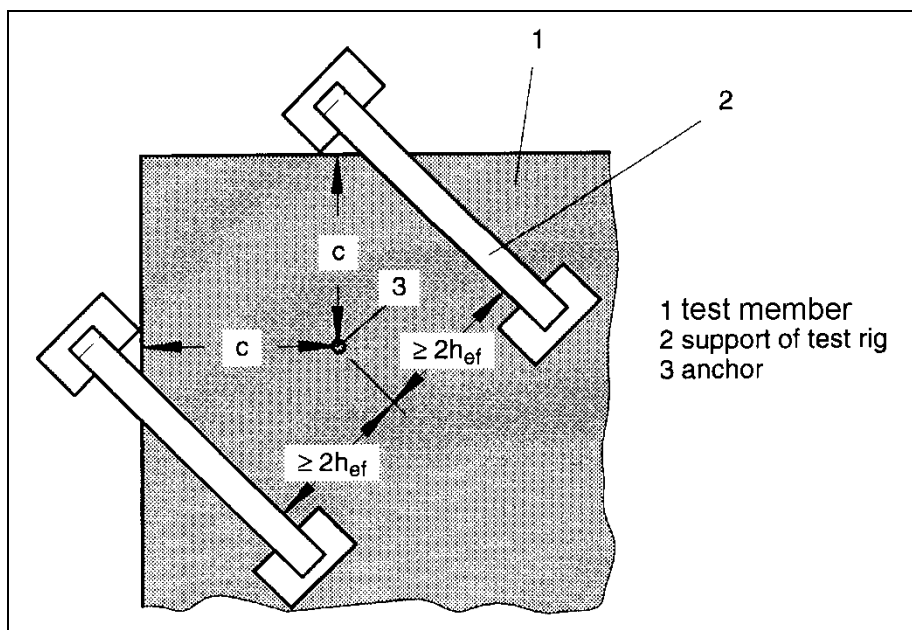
Example of the test rig for tension tests on anchors at a corner
